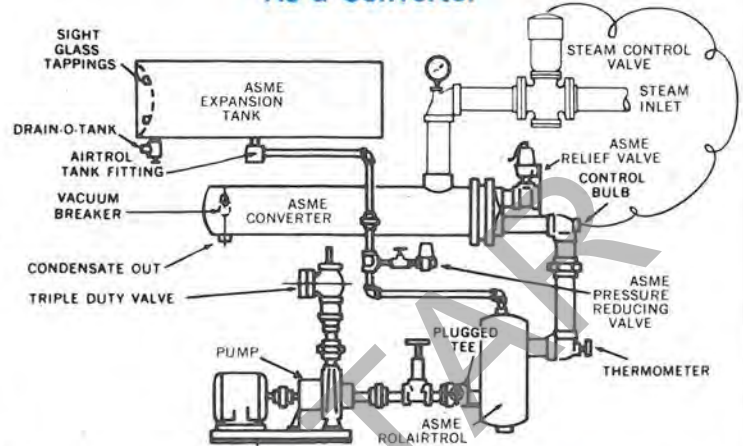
Typical installation of "SU" Heat Exchanger when used as a Convertor.
